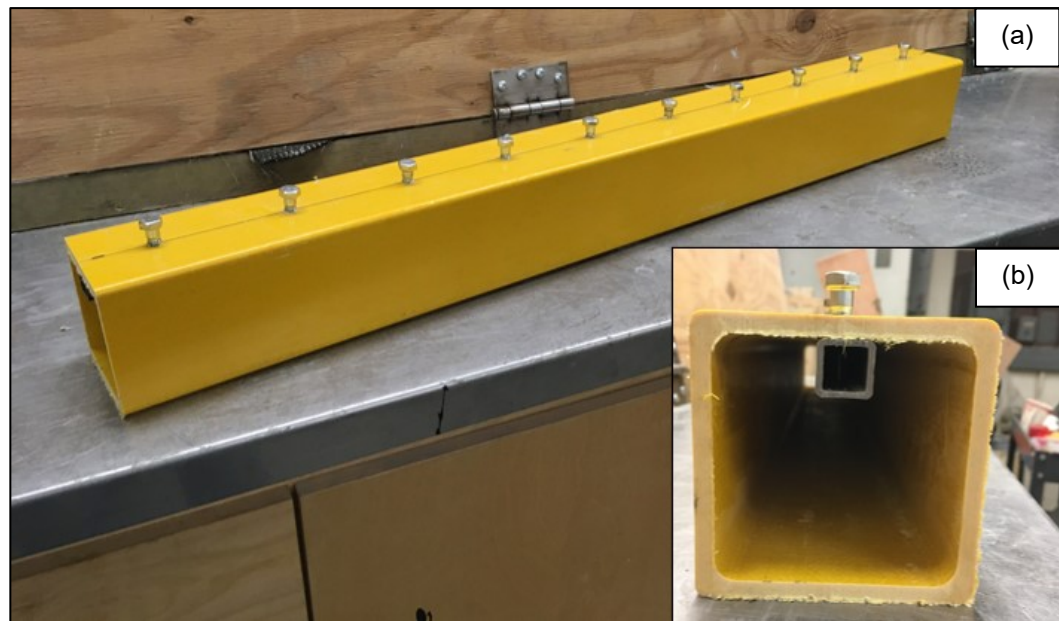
Specimen with bolted connectors before slab was cast overtop
